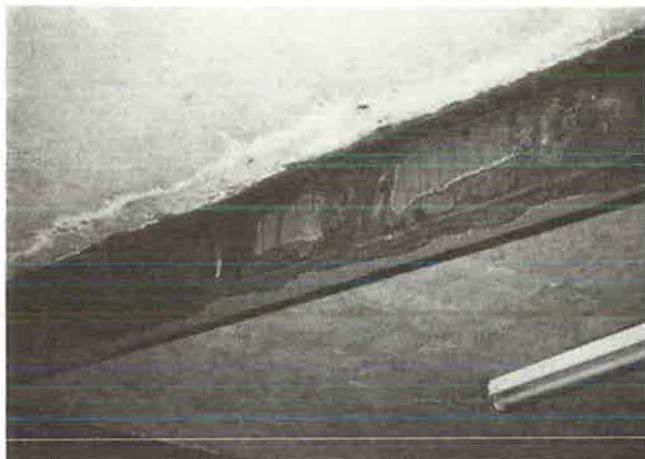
Salt stains and corrosion patterns on a weathering steel parking garage in Cleveland, Ohio.
